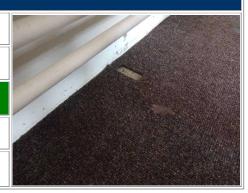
Vinyl floor tiles (beige) below carpet and modern screed and bitumen adhesive below
